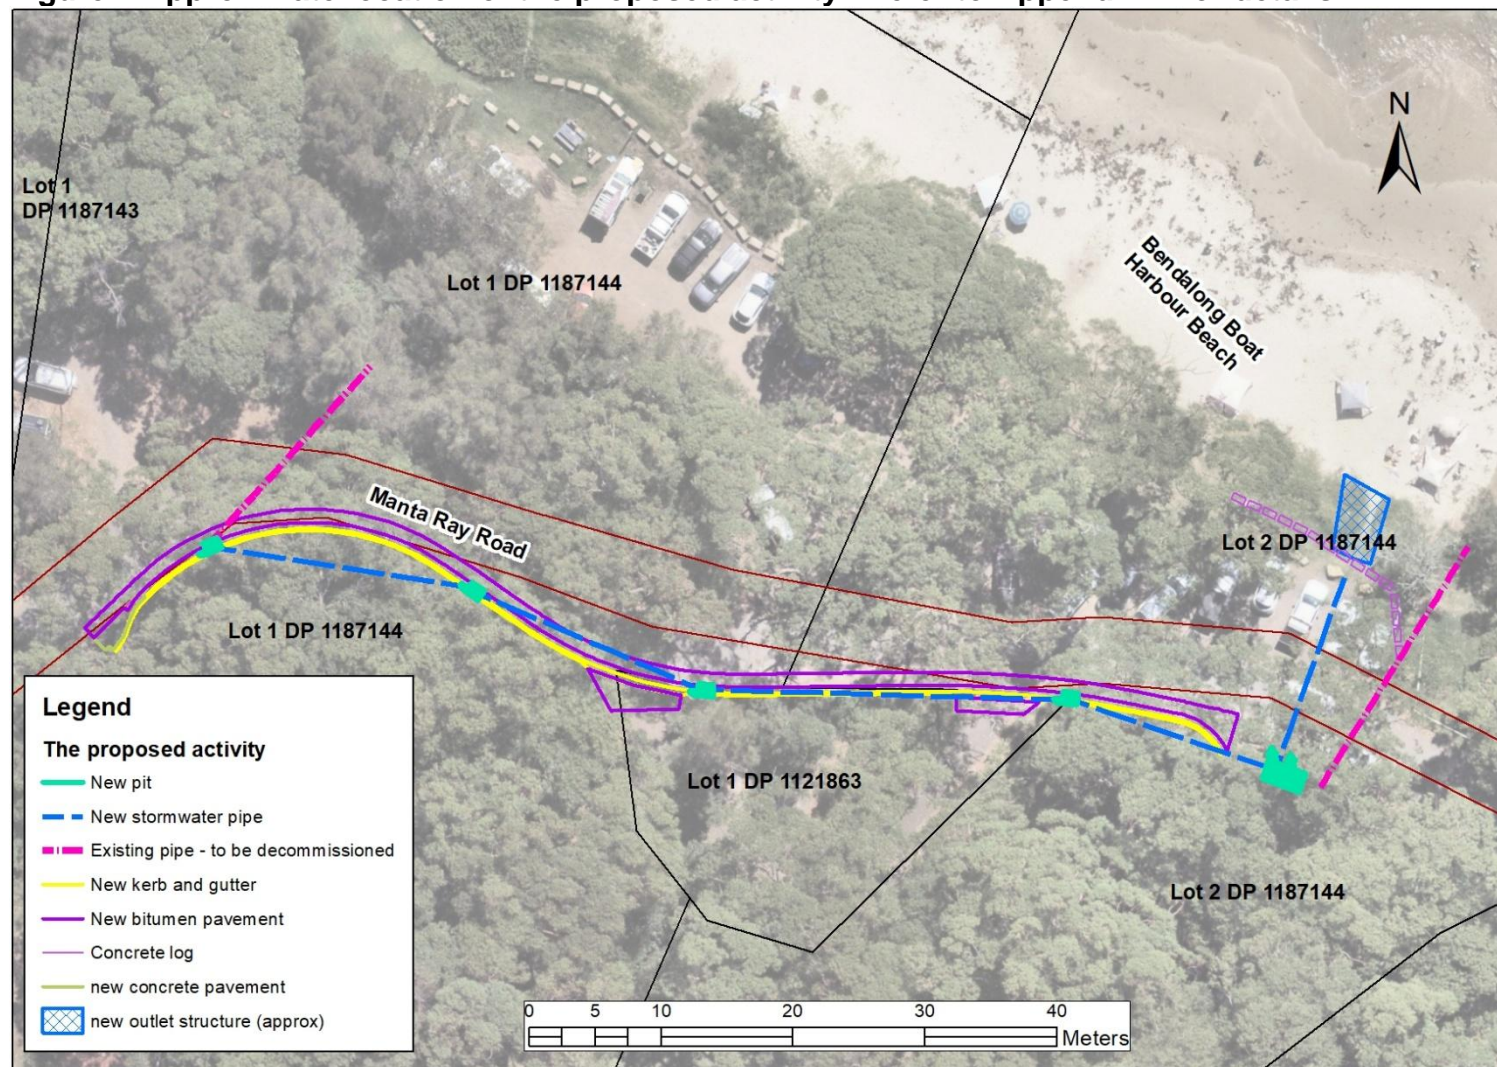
The proposed activity (refer to Figure 4 below for beach outlet structure plans - refer also to detailed plans in Appendix A)
